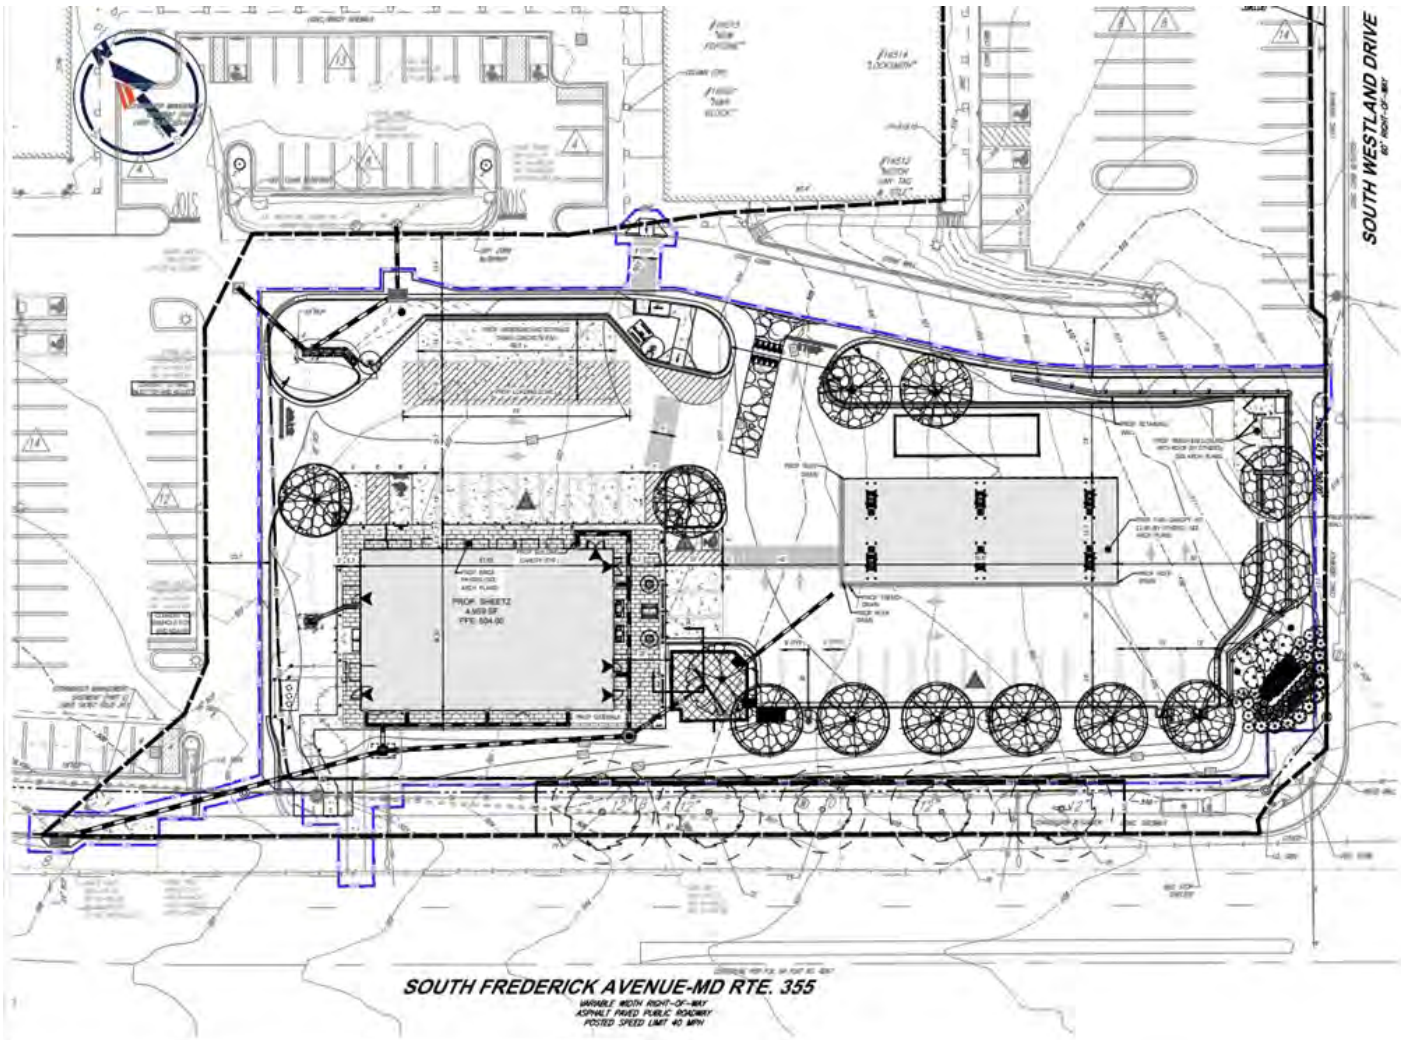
Forest Conservation Plan (Sheet L-103)
